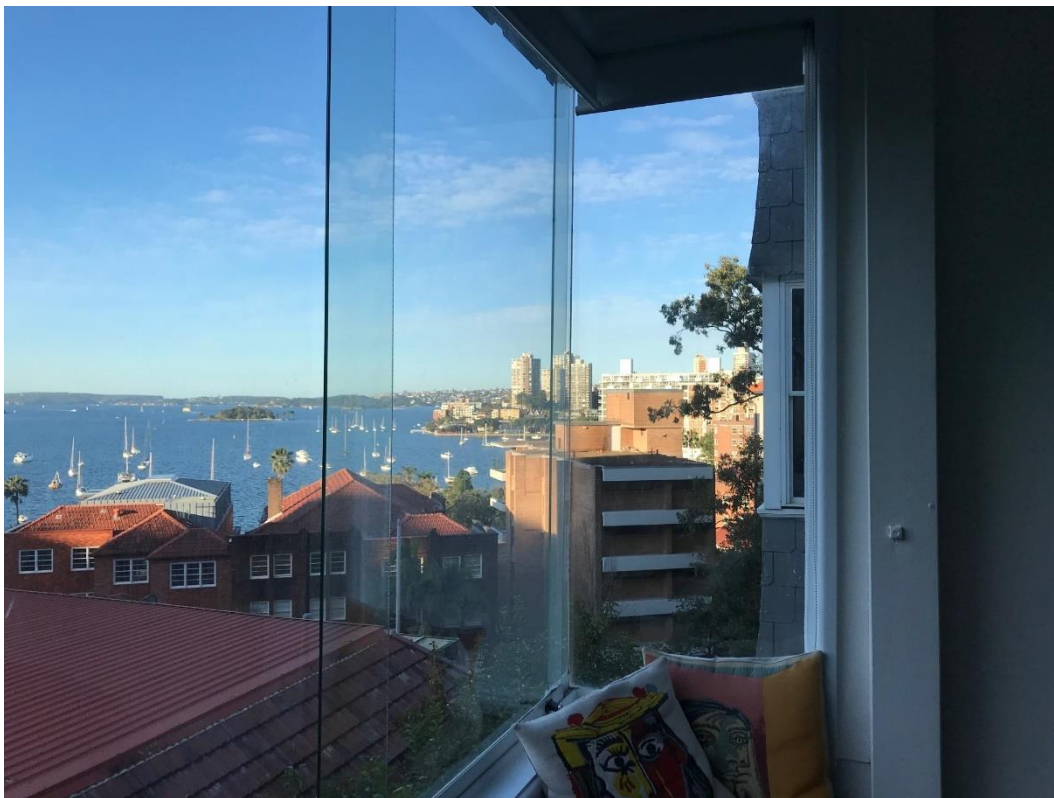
Existing water view to be retained from enclosed balcony of Unit 5/13 Onslow Avenue
